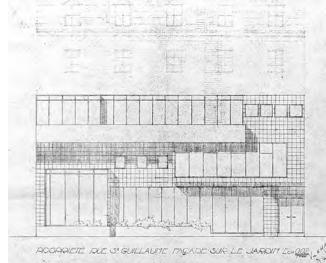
,b: Maison de Verre. Facade court and facade garden, possibly drawn by Bijvoet. (Source: Molema 2014)
